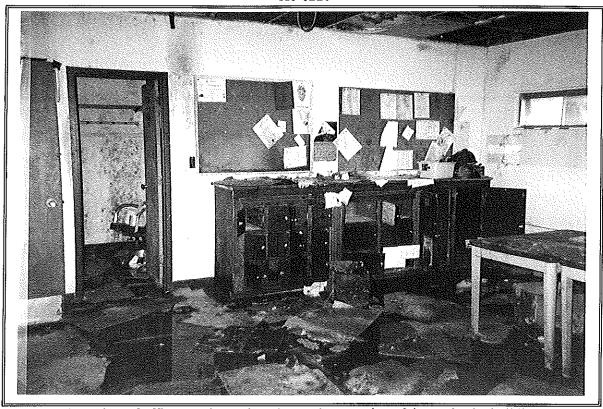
View of typical hallway located throughout the southern section of the study site building.
